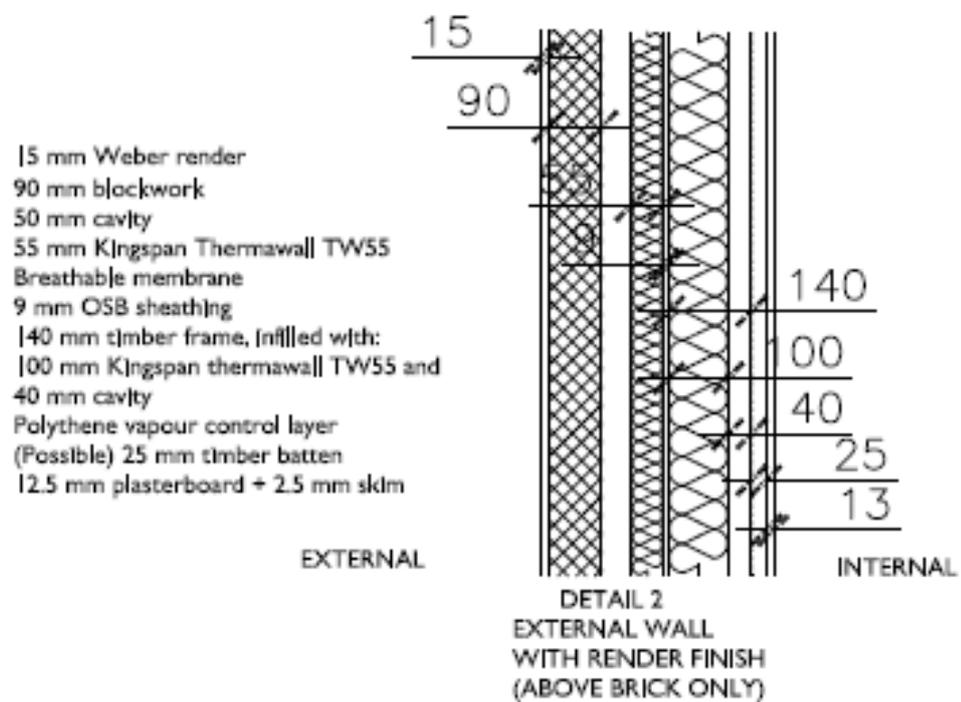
Phase 1 – First Floor Cross Section of Timber Frame Wall (Render Finish)
